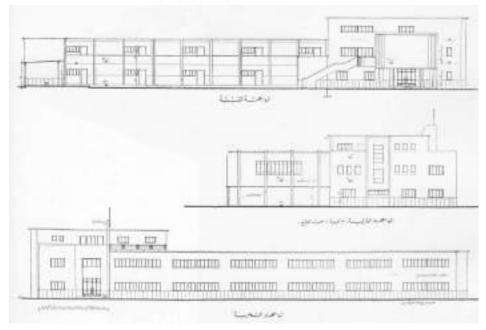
Elevations of Standard School Building (Makar & El shahed, 2019)
